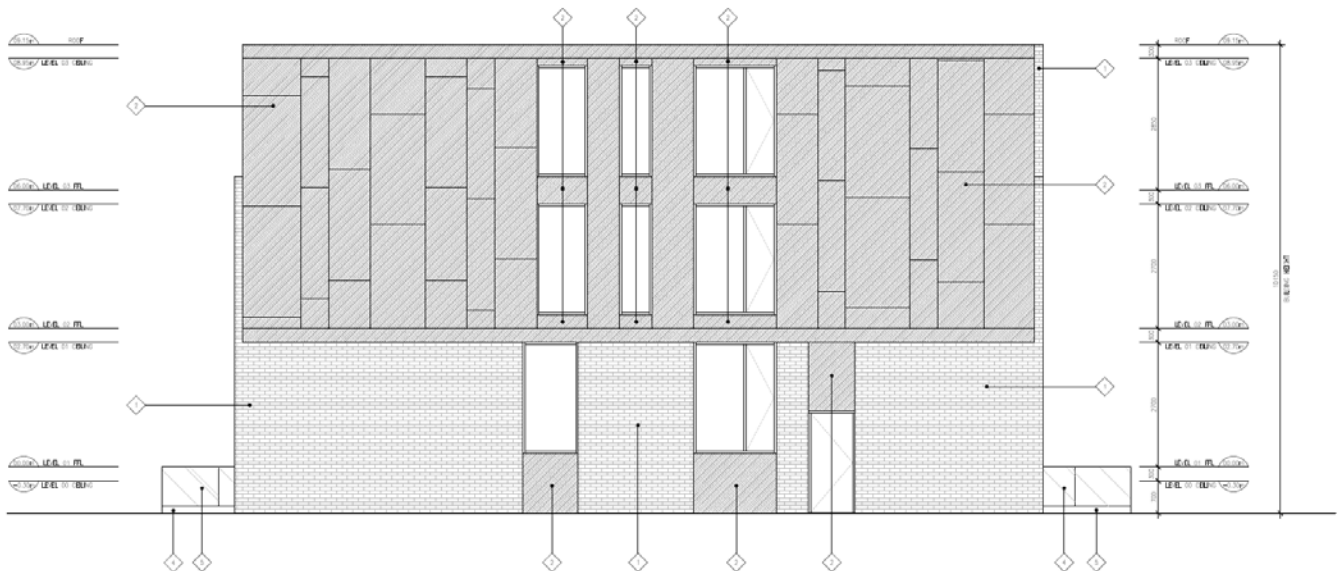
West elevation – facing driveway shared with 20 Hawthorne
